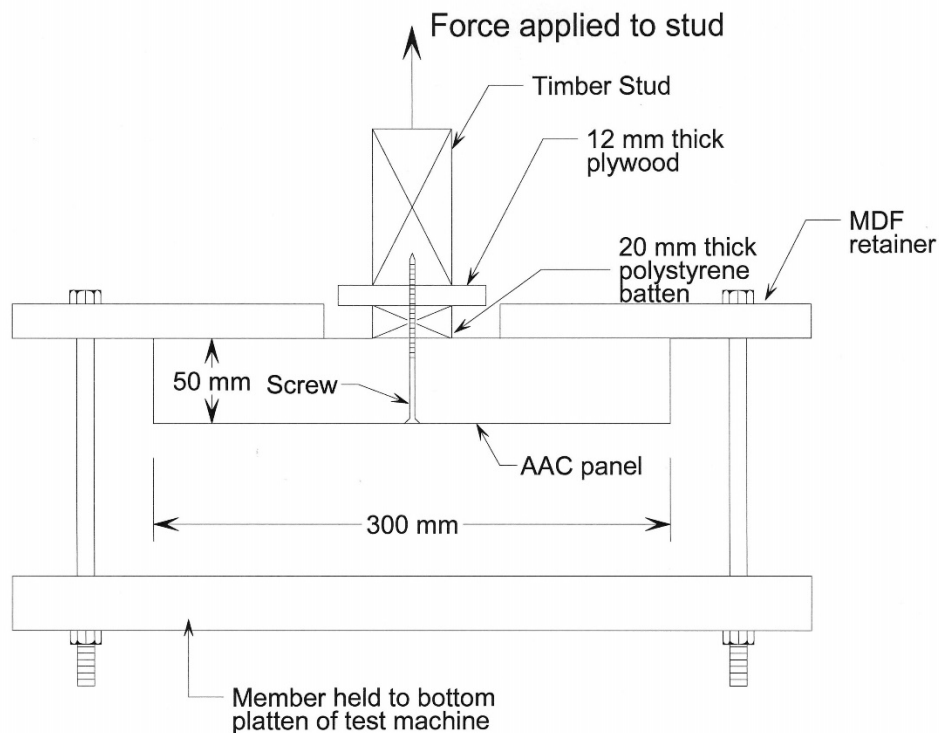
Rockcote Pull-Off Specimens and Connection Testing Apparatus
